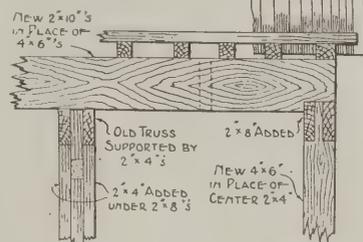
Side View of Tank and Support with New Joists in Place as Viewed at Right Angles to the Elevation in Fig. 1
